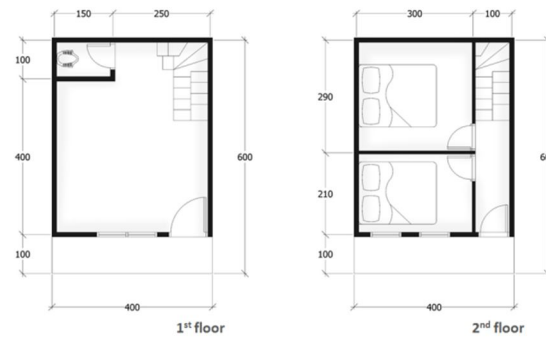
Examples of Alternative Layout Plan of Houses in the Settlement
